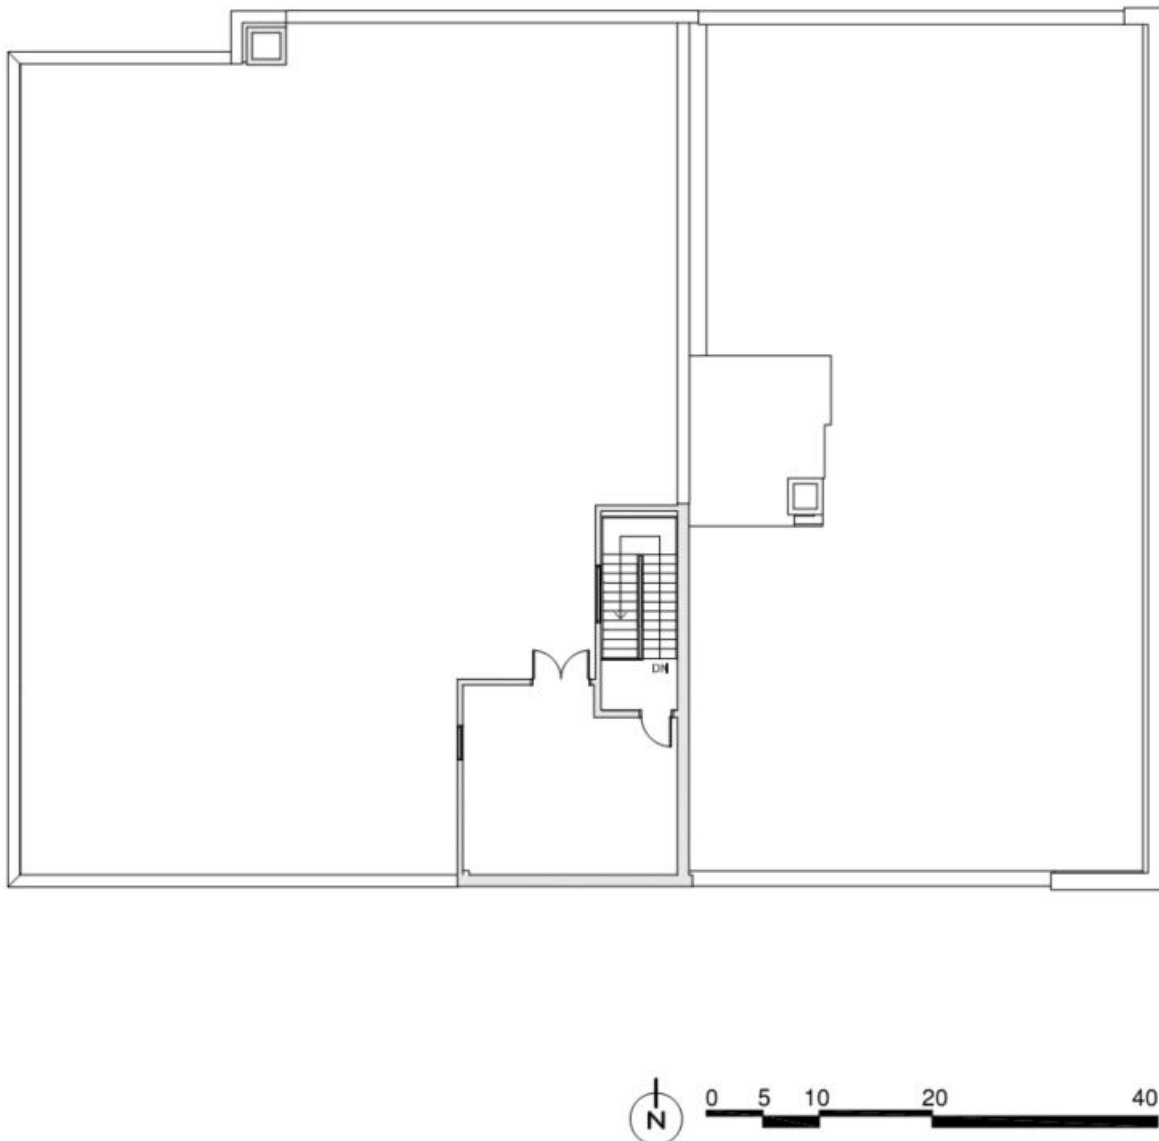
Roof Photographic Key Plan. Alley Poyner Macchietto Architecture, Omaha, Nebraska, 2021
